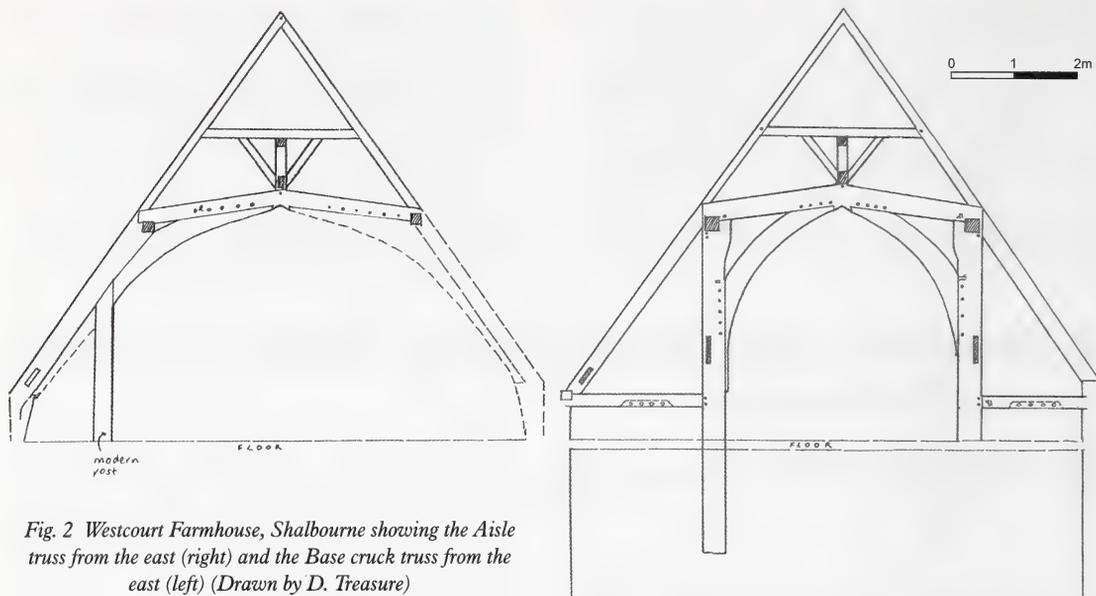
Westcourt Farmhouse, Shalbourne showing the Aisle truss from the east (right) and the Base cruck truss from the east (left) (Drawn by D. Treasure)
